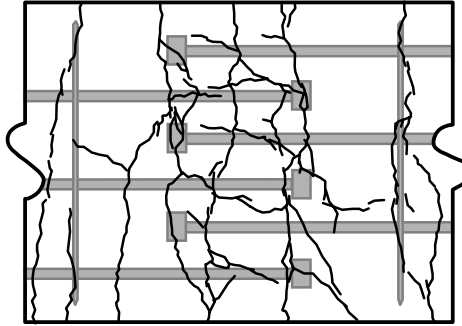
Crack development in the transverse stirrup cage test (specimen LS-08-04.04-12-10(N)-1-TTD) (continued)
